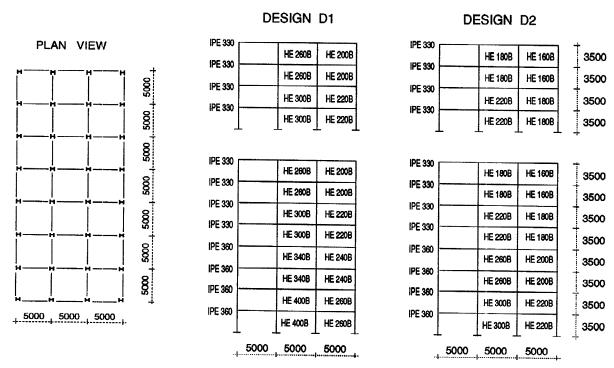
Plan view and member cross section sizes of the analysed steel framed structures.
